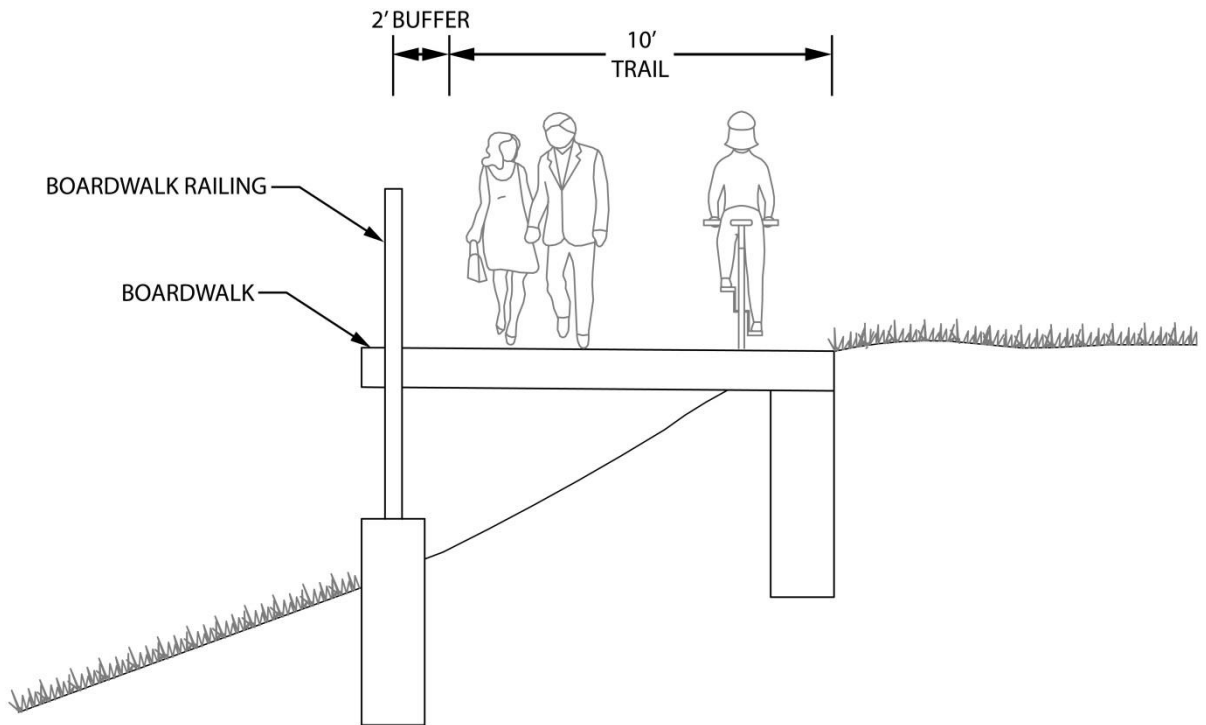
Typical raised Old Cameron Run Cross Section with Boardwalk
